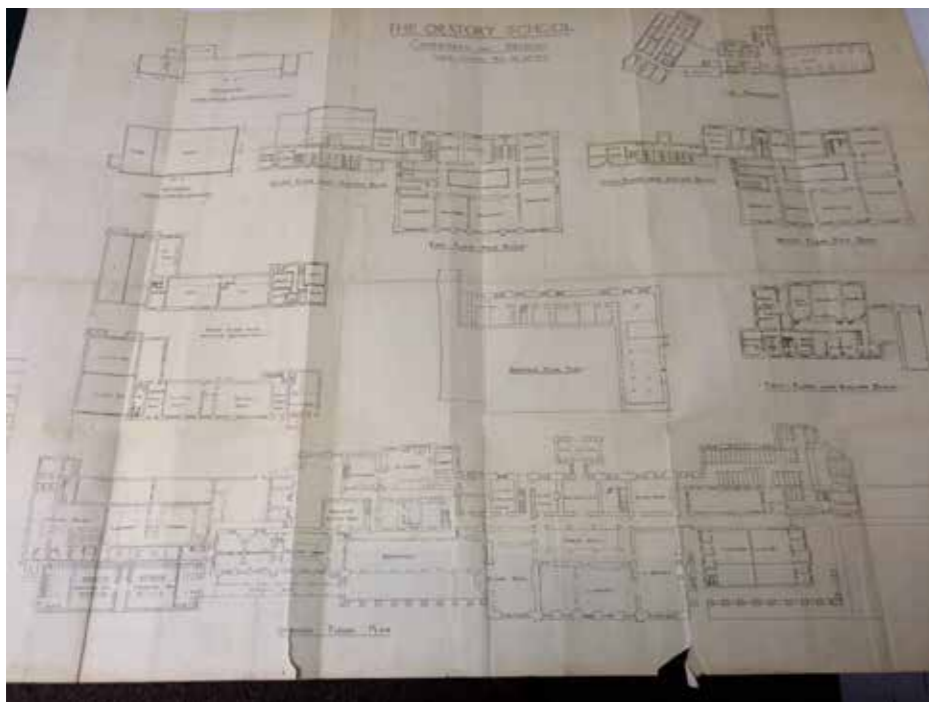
1920s to 1940s ground floor plan from BBC archive
